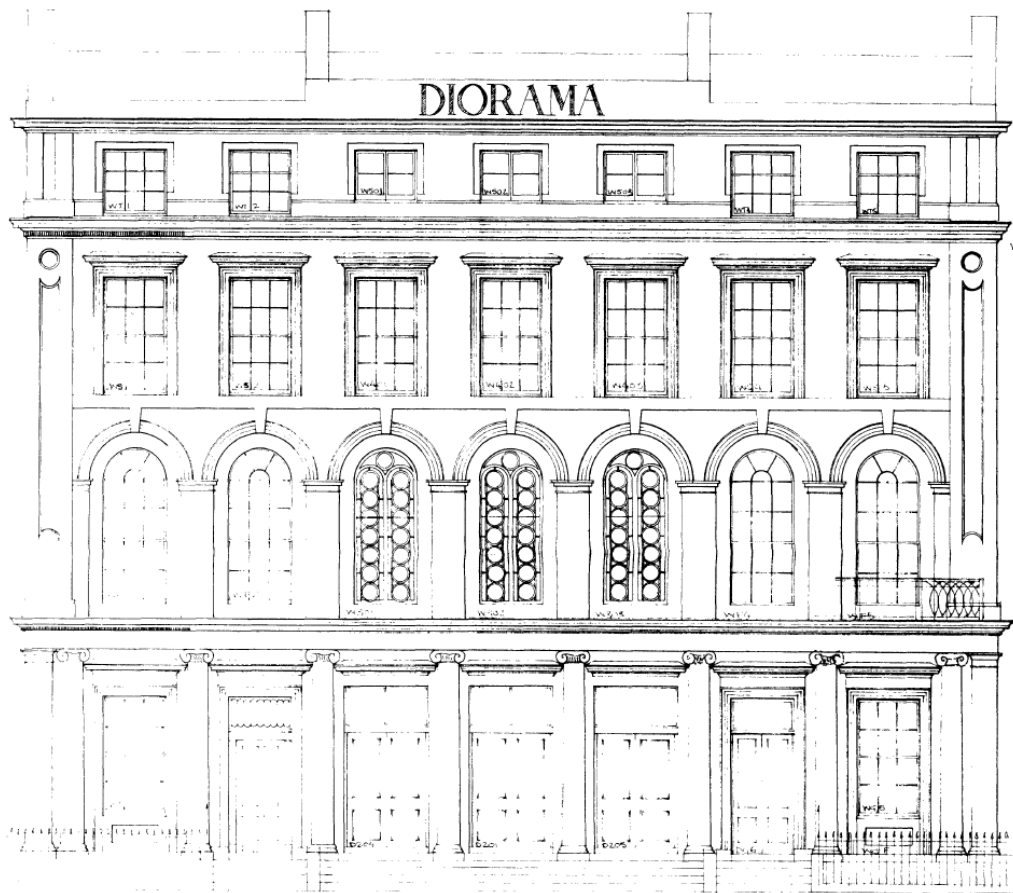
Existing Park Square East elevation, 1994. Camden planning ref: HB/9370268.
